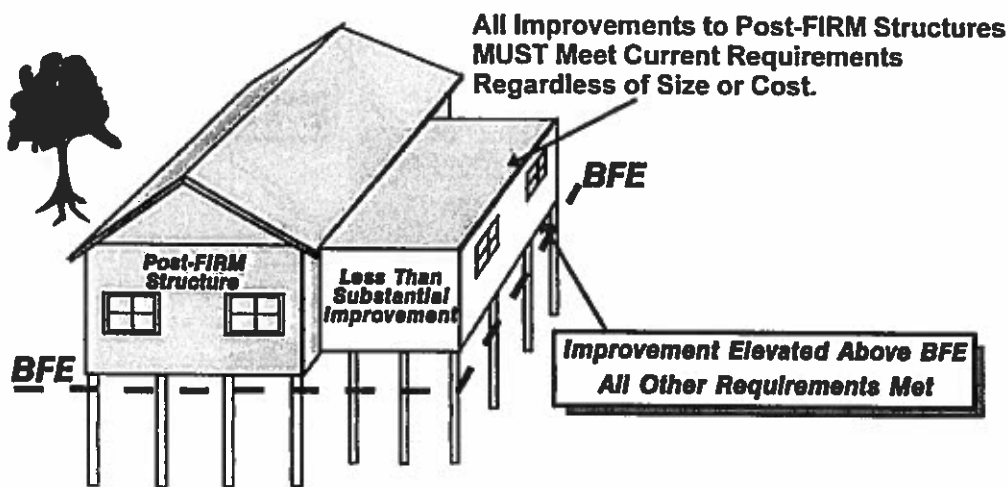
Small additions to post-FIRM buildings must be elevated.
